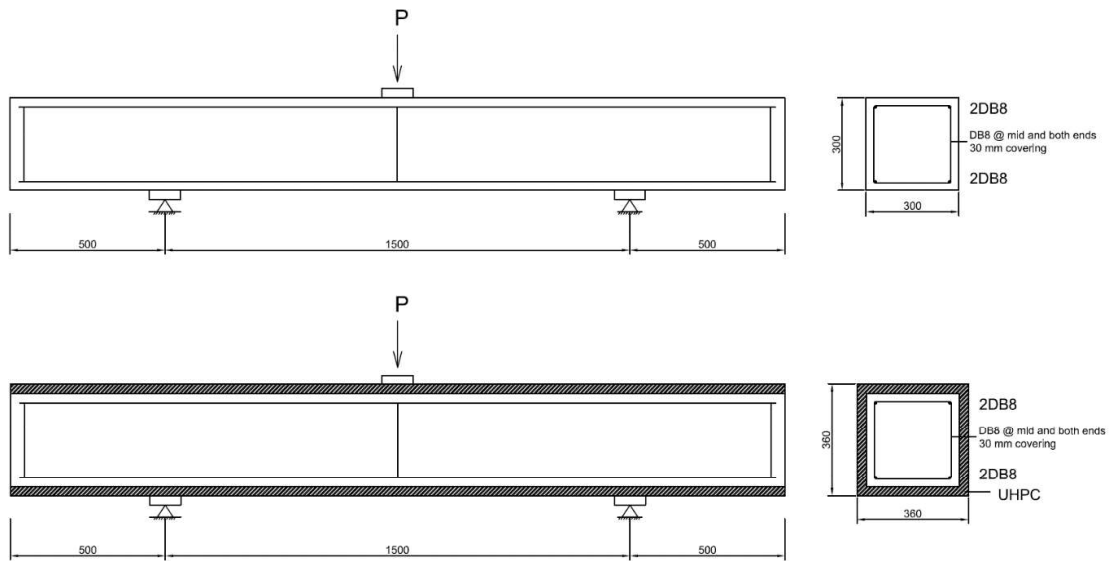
Experimental model details of NSC (top) and composite concrete (bottom).
